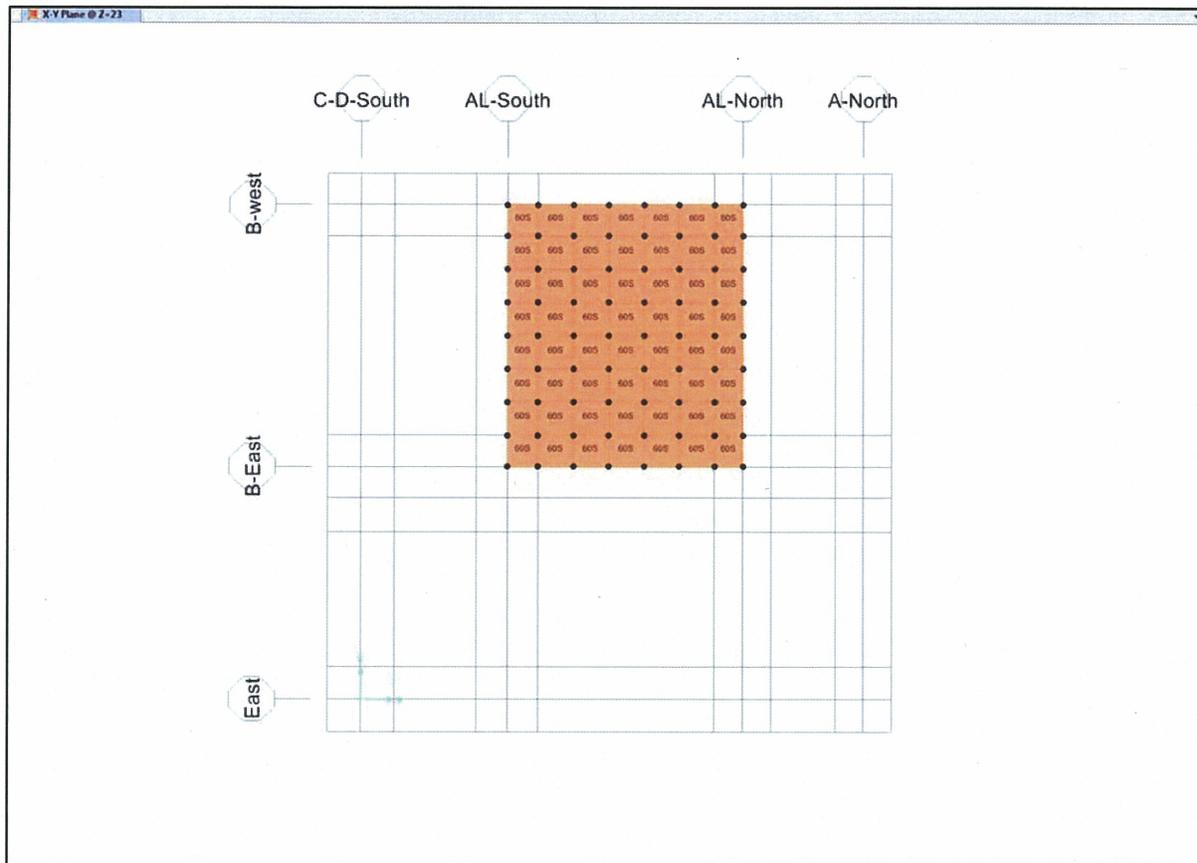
REC SAP2000 B-Cell Top of Concrete Plan at Z = 23-ft
